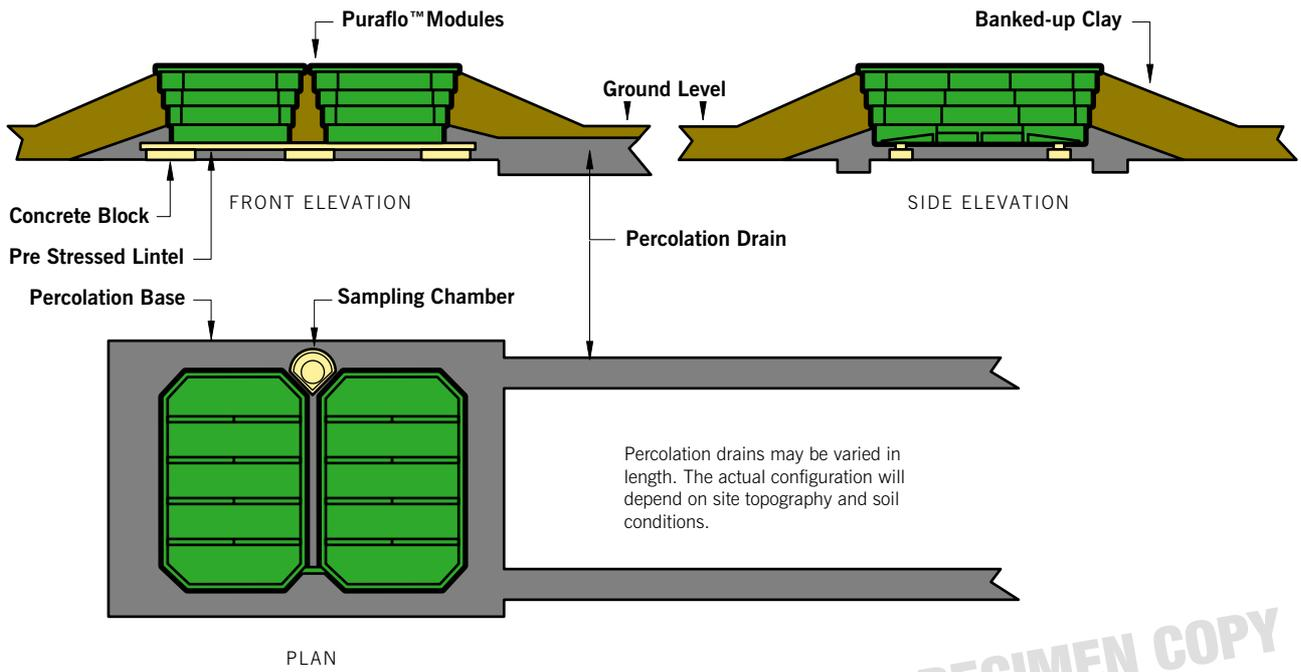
Typical Sub-Surface Disposal Field. (Drawing not to scale)
